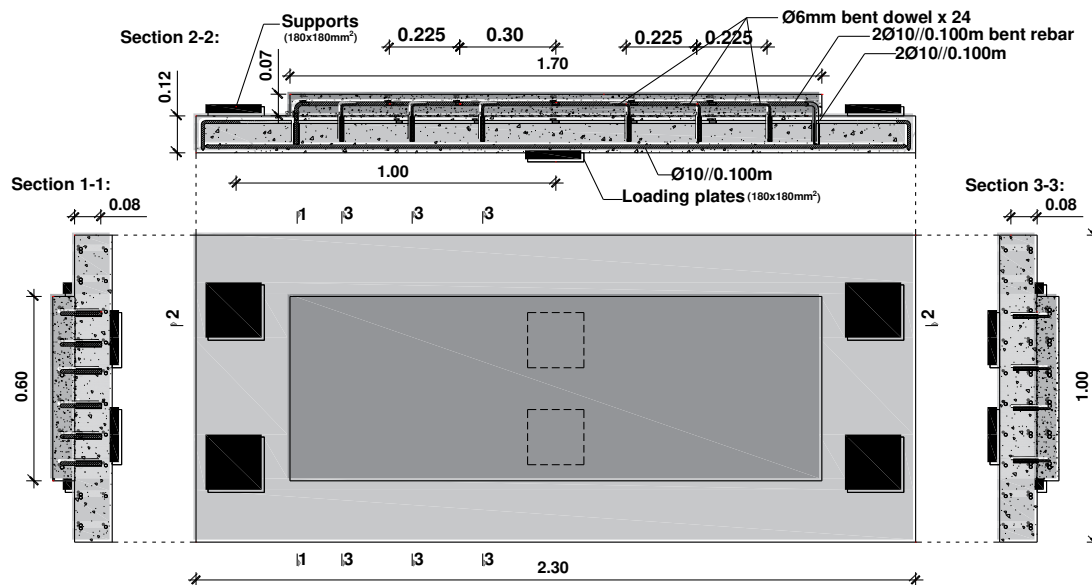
Rebar detailing and strain gauge placing for R<sub>L</sub>-STANC specimens.
